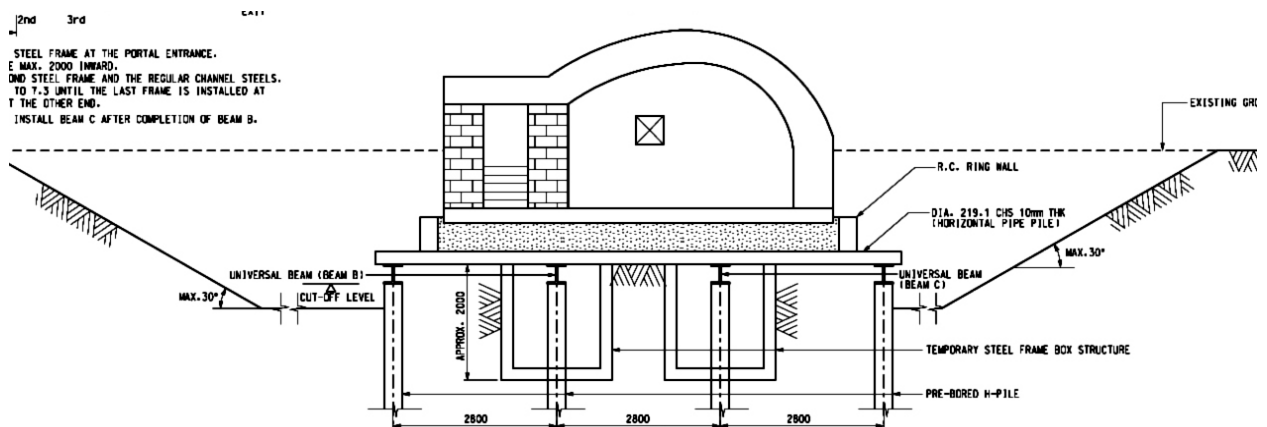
Site section shows the excavation and installation of pipe piling underneath the pillbox.
